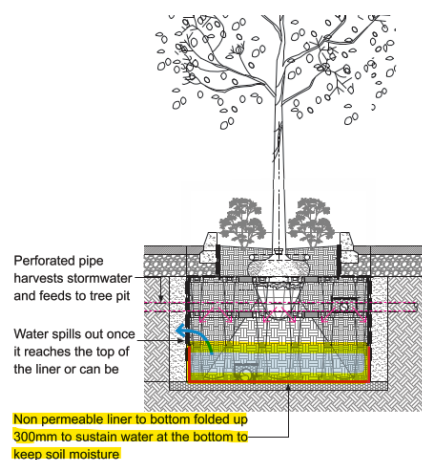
Wicking Bed system (Source: Adapted from Citygreen standard details)
